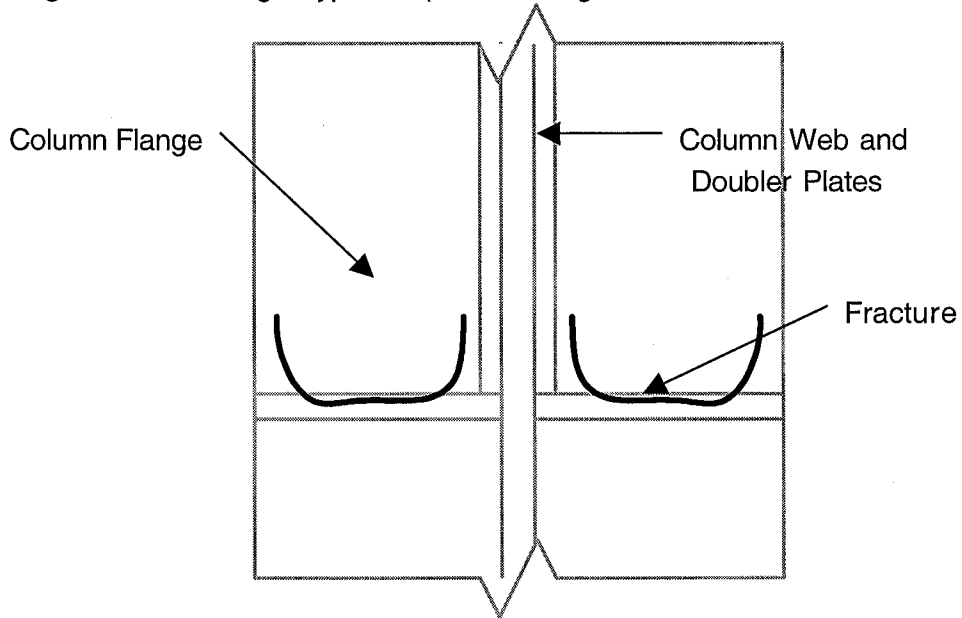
Damage Type C4* (U-Shaped Column Flange Fracture)
